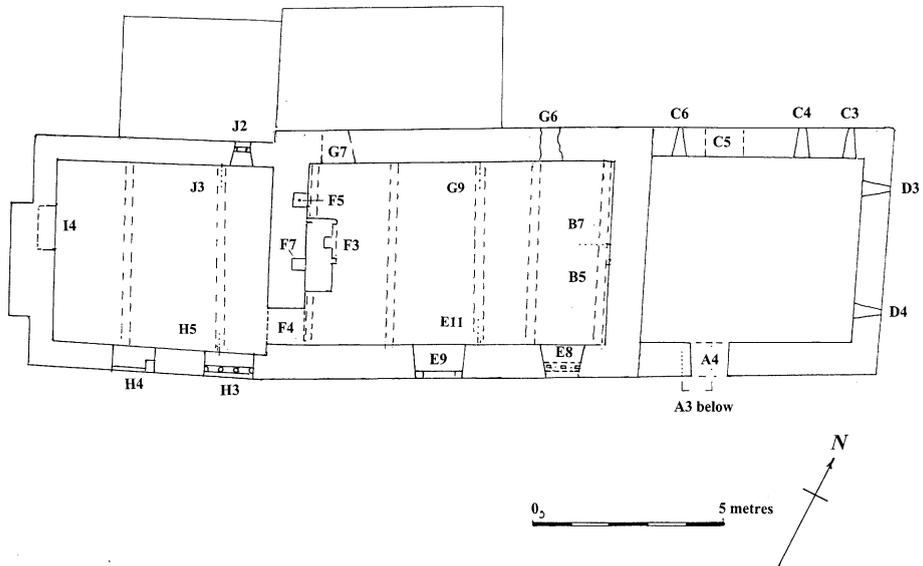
Steel, 'The Tenement' First Floor Plan (1:200). P. F. Ryder, 1994/9. For key see text.
